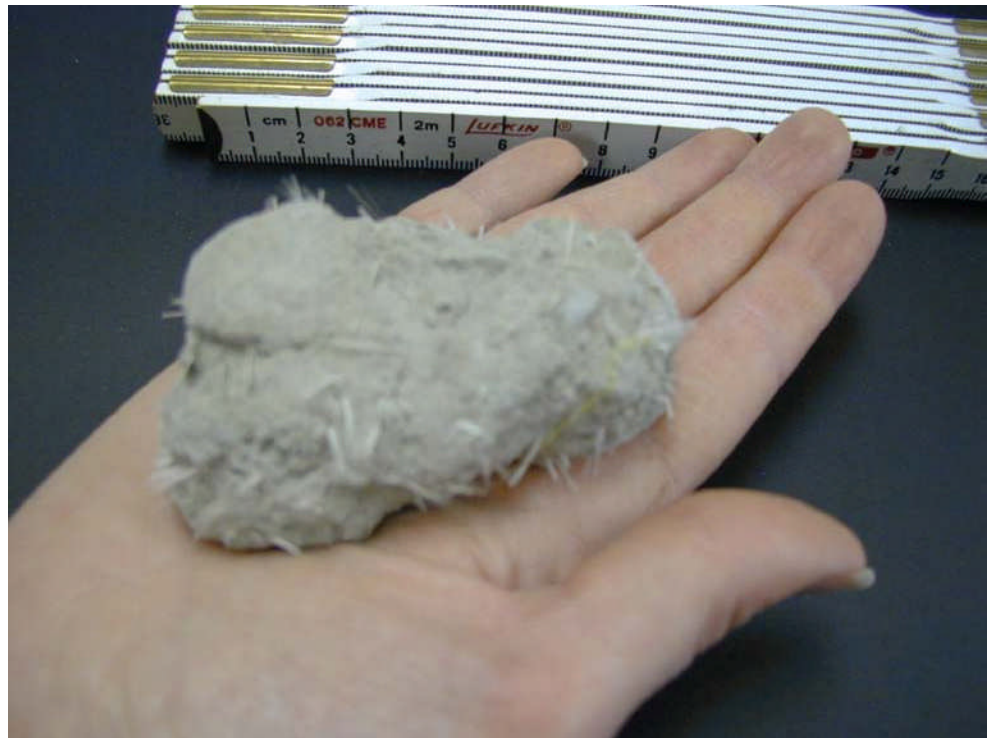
Fiber Reinforced Concrete (FRC)
